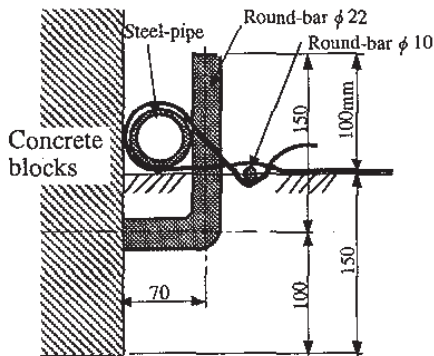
Detail of the connection between the reinforcement and the metal joint.
